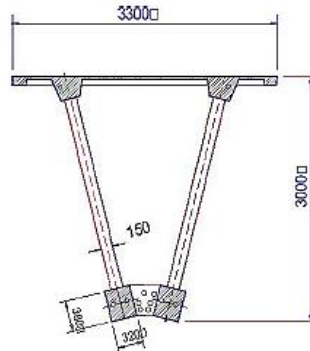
Typical cross section of Sherbrooke footbridge [101]
